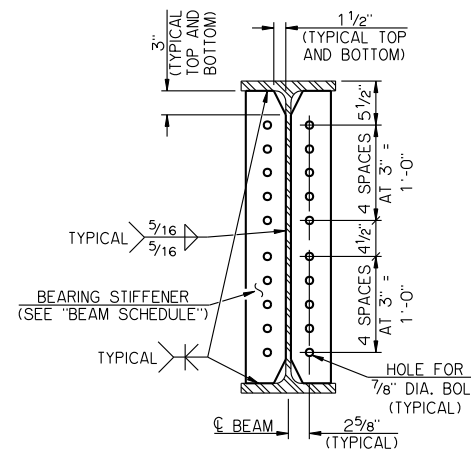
DETAILS SHOWN AT INTERIOR BEAM. OMIT INTERMEDIATE DIAPHRAGM STIFFENERS AT OUTSIDE FACE OF EXTERIOR BEAMS.
